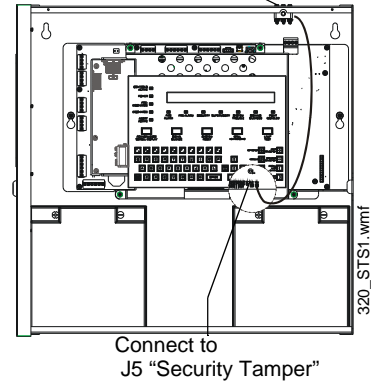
Installing the STS-200 or STS-1 Security Tamper Switch
